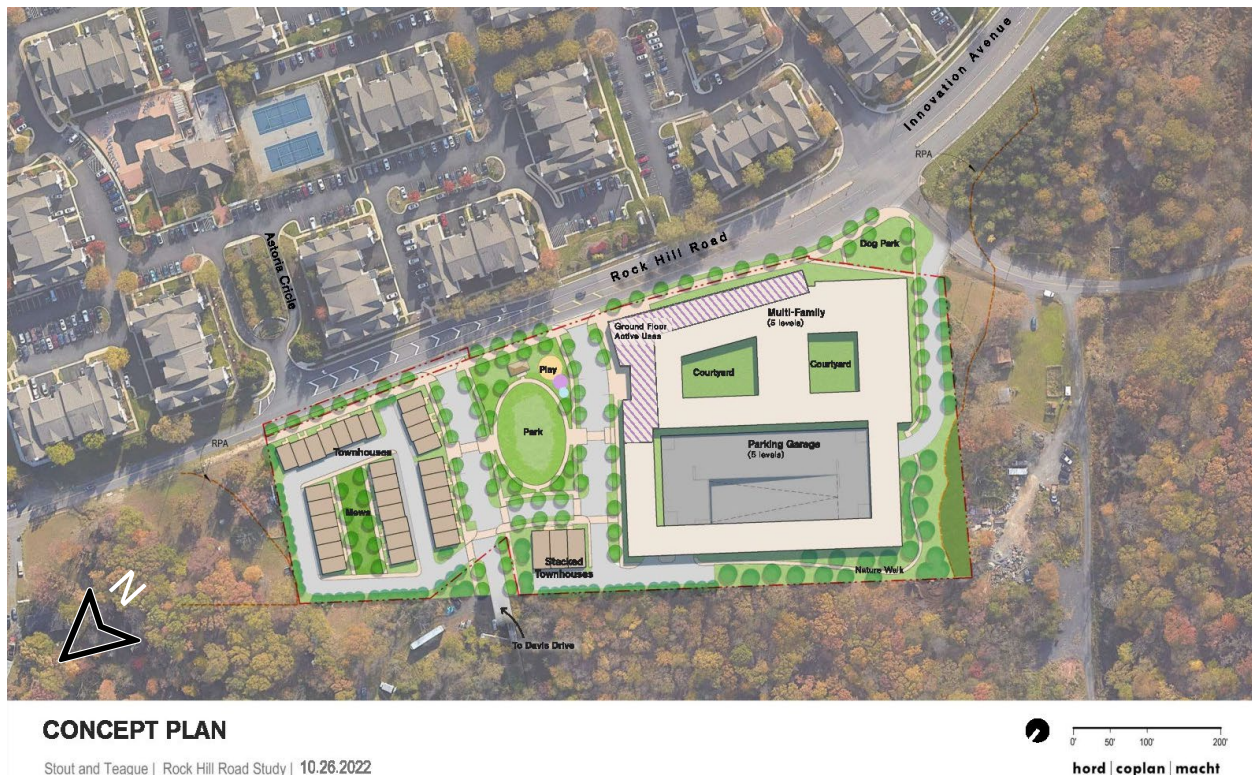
Rock Hill Road Concept Plan, Source: Stout and Teague
